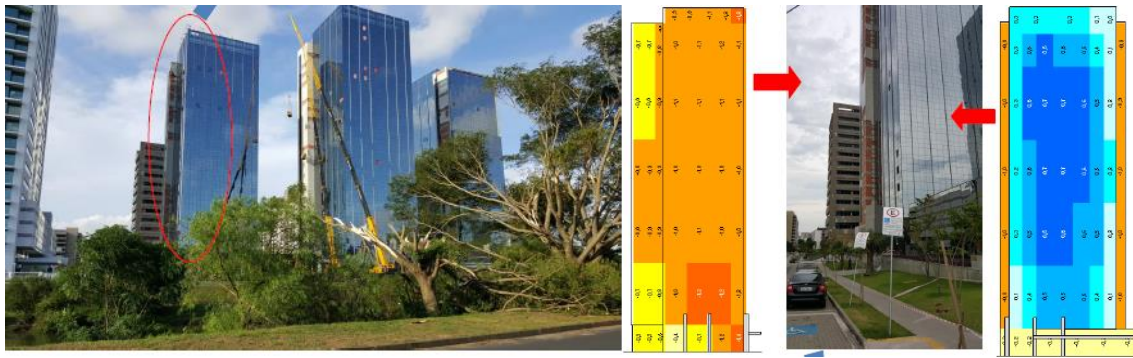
Full-scale damage caused by downburst and mean pressure coefficient diagrams on buildings façades from boundary layer wind tunnel tests (suction = red, yellow; pressure = blue) for Tower A
